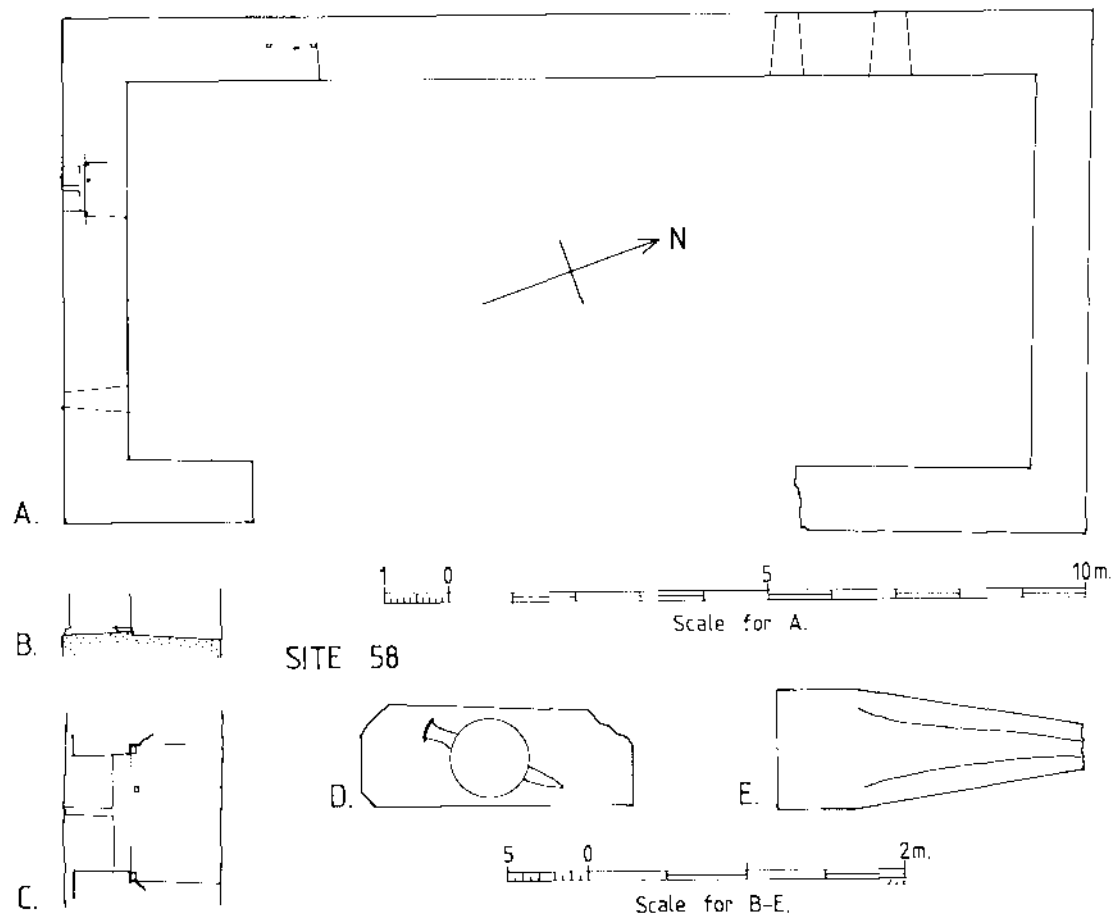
Fortified house at Site 58; (a) plan, (b)-(c) section and plan of S window, (d) shield relief, (e) water spout
